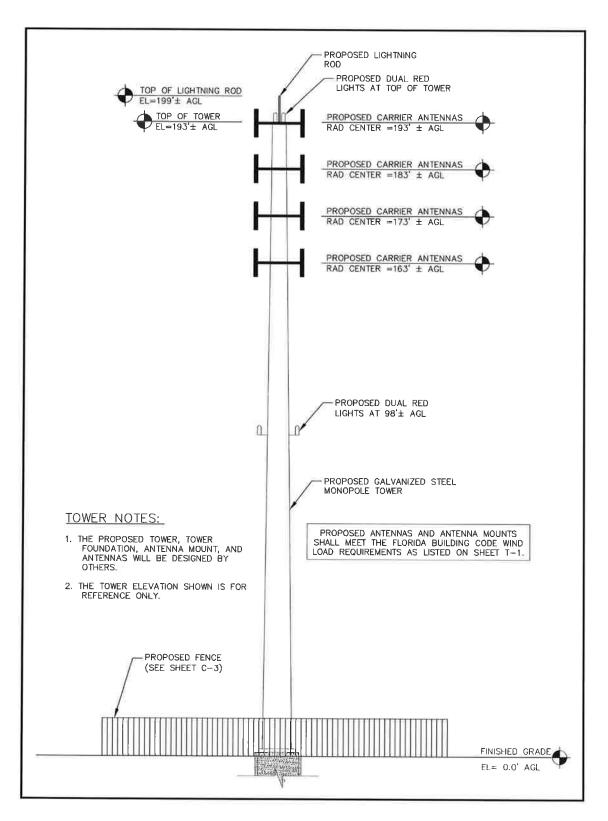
Elevation Sketch of Proposed Monopole Tower
